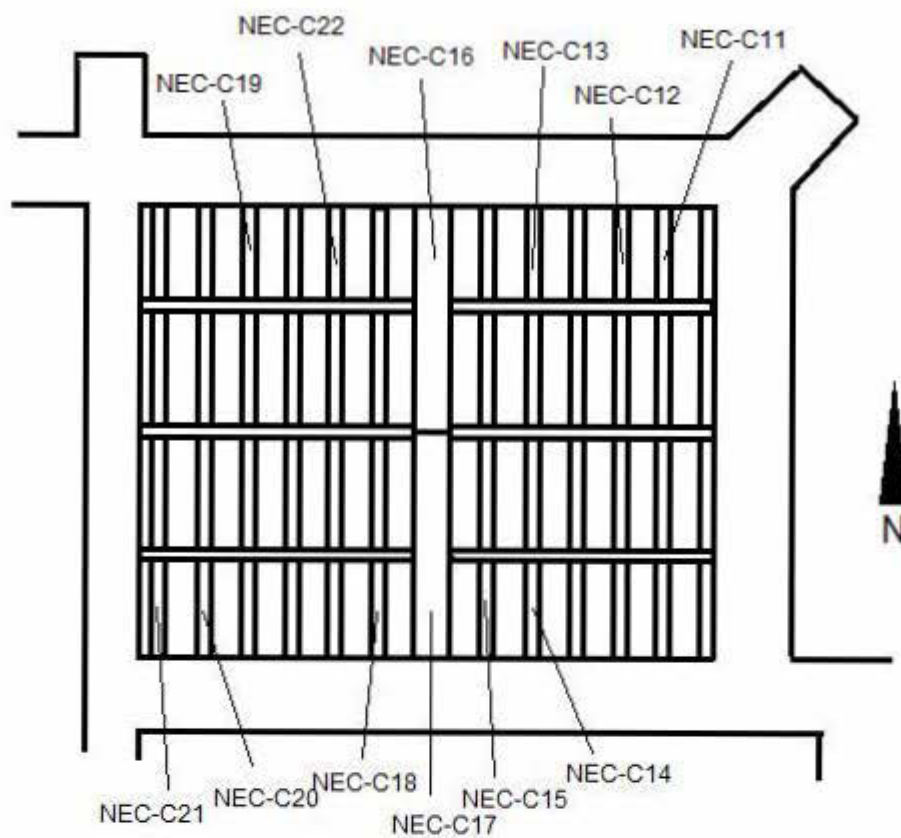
Plan of Vestry roof, showing the location of samples NEC-C11-22
